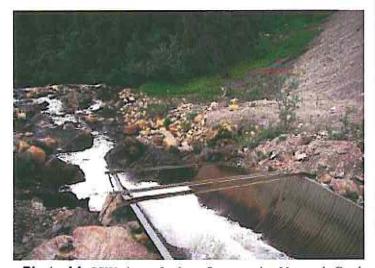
SSW view, of culvert flow entering Vangorda Creek, as well as the toe of bank adjacent to main haul access road.
